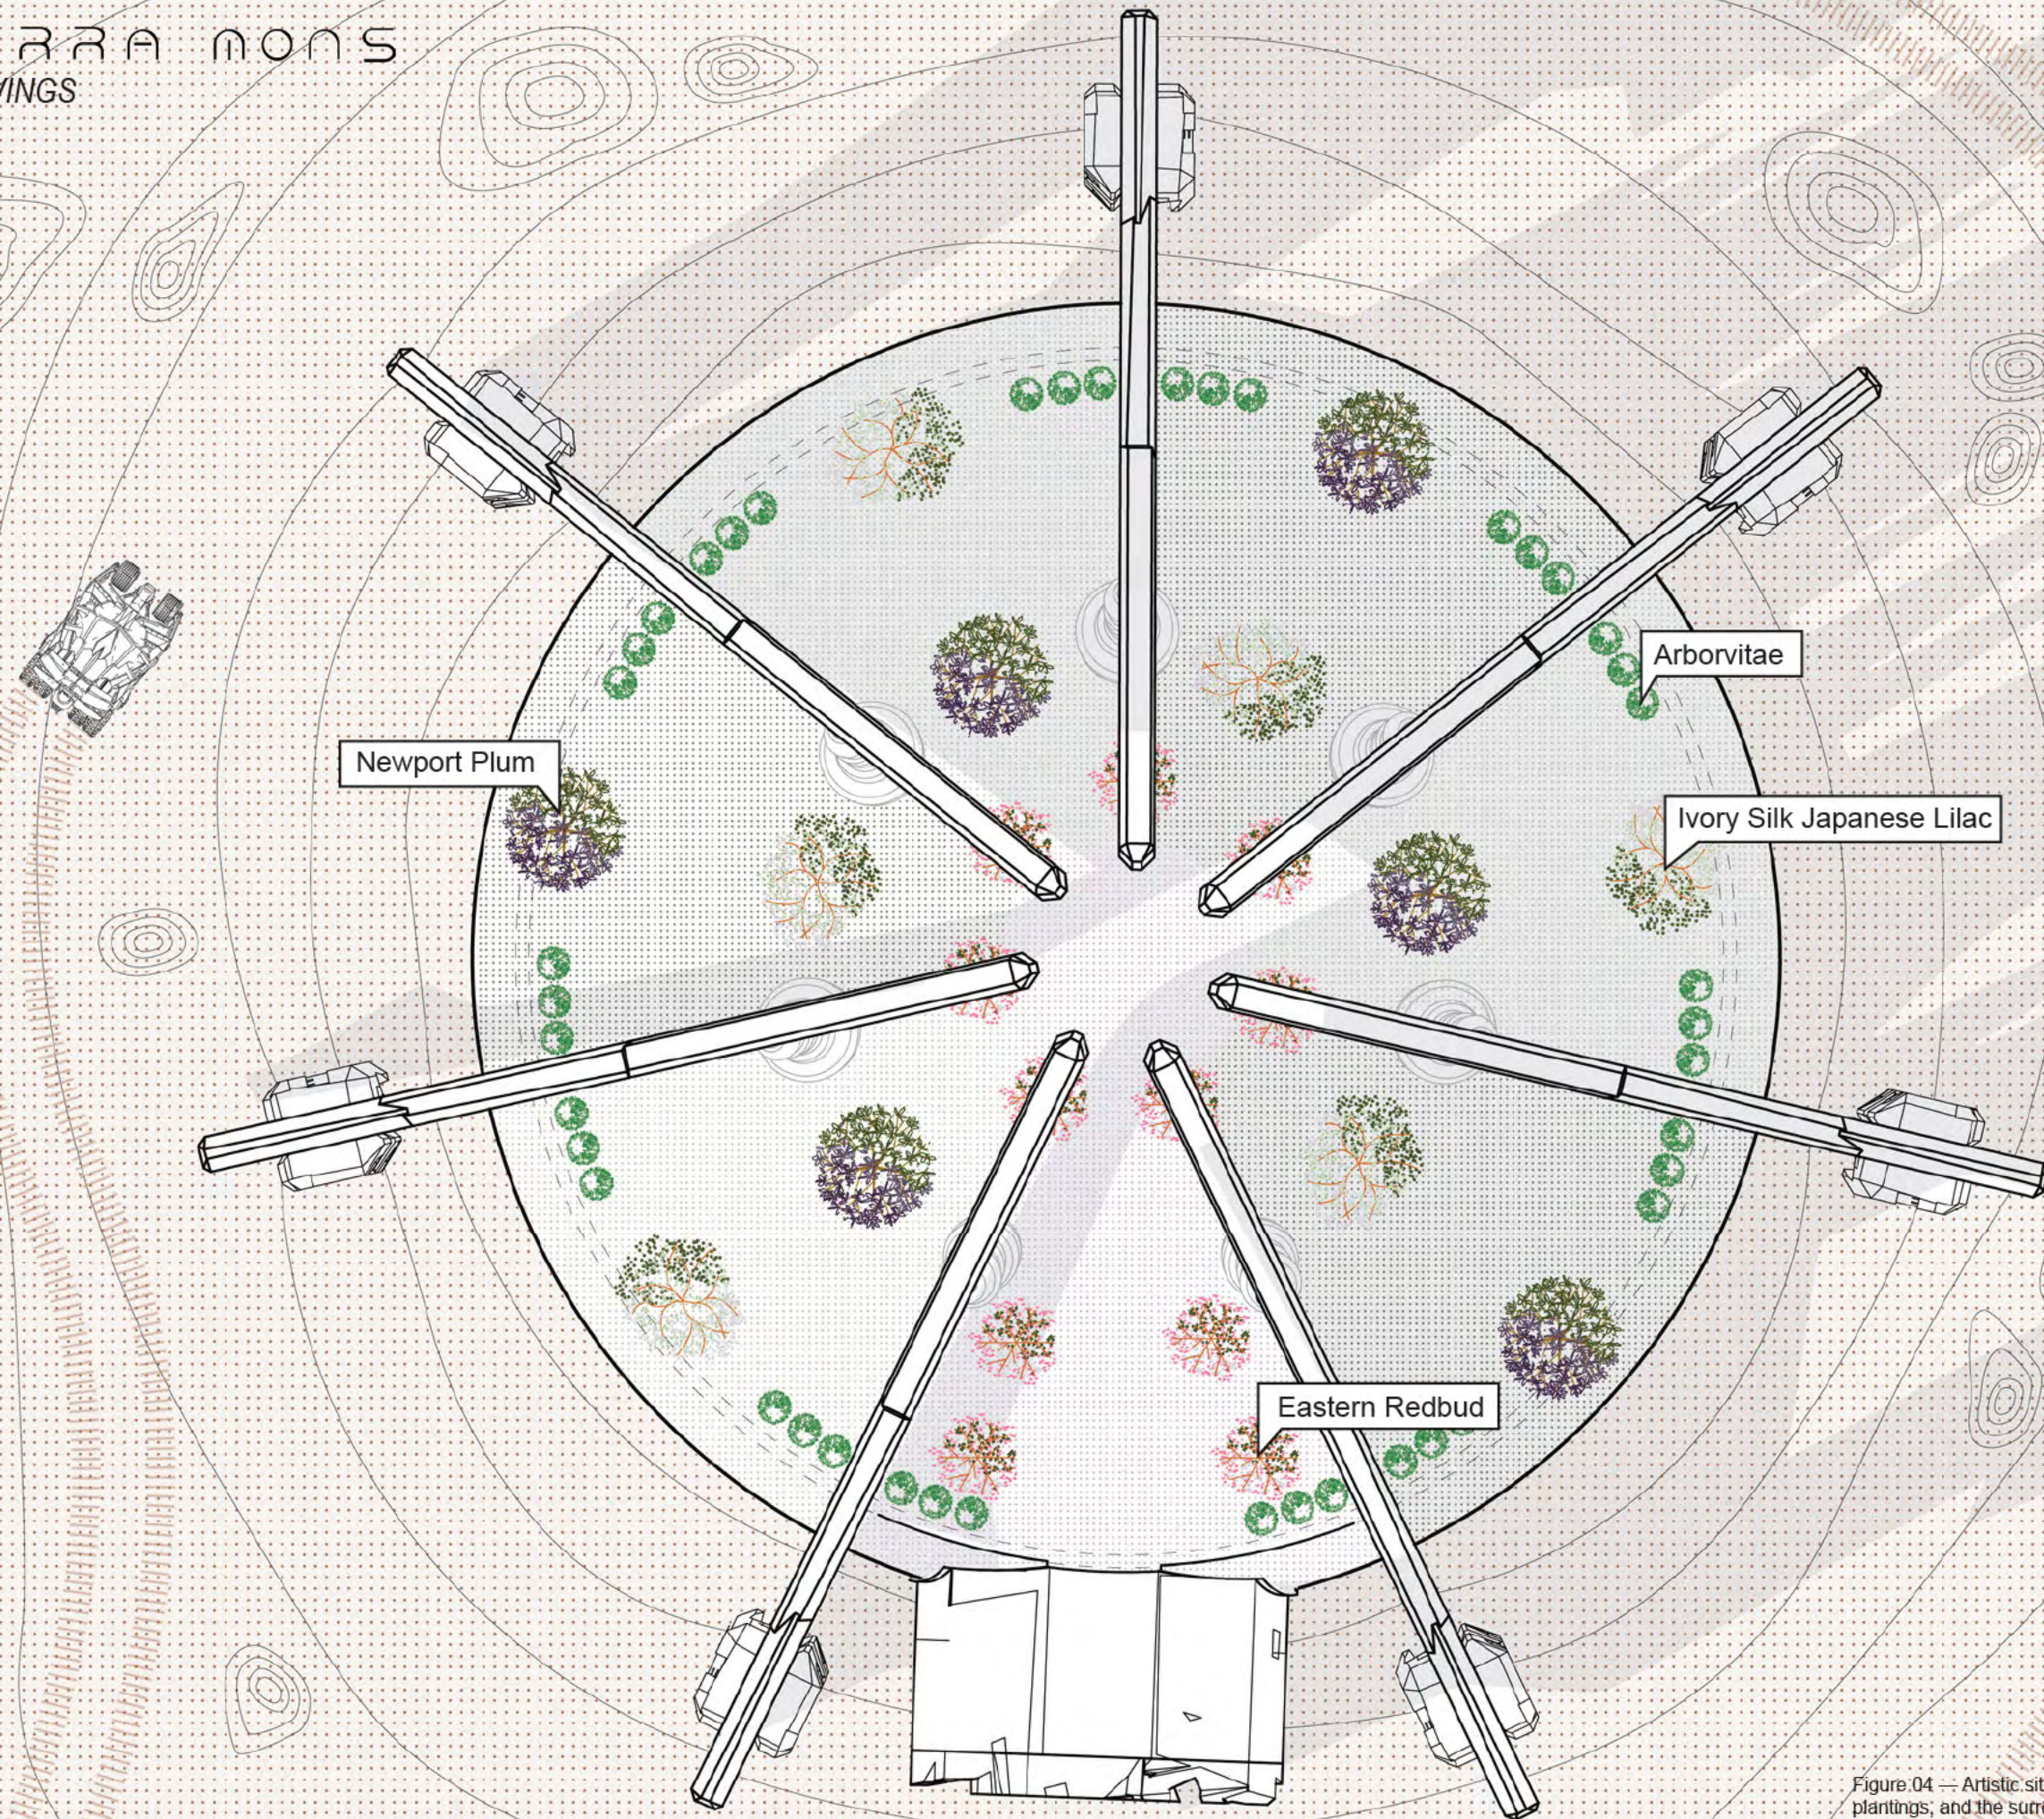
Artistic site plan detailing the guardian buttresses, the interior plantings, and the surrounding landscape.
